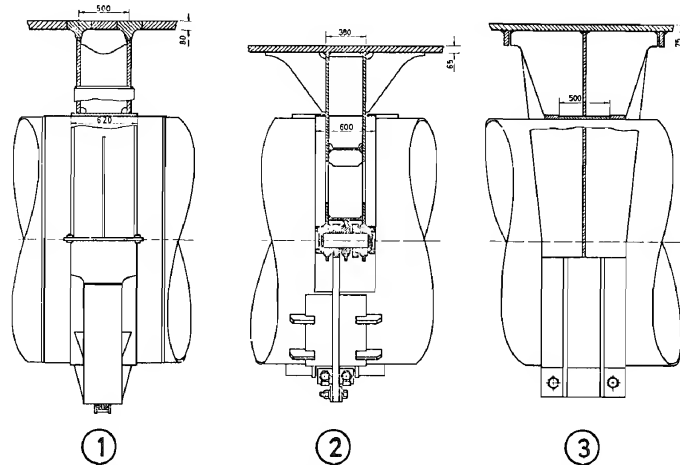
Cooling tube mounting: fixed bearing (from Münk)
